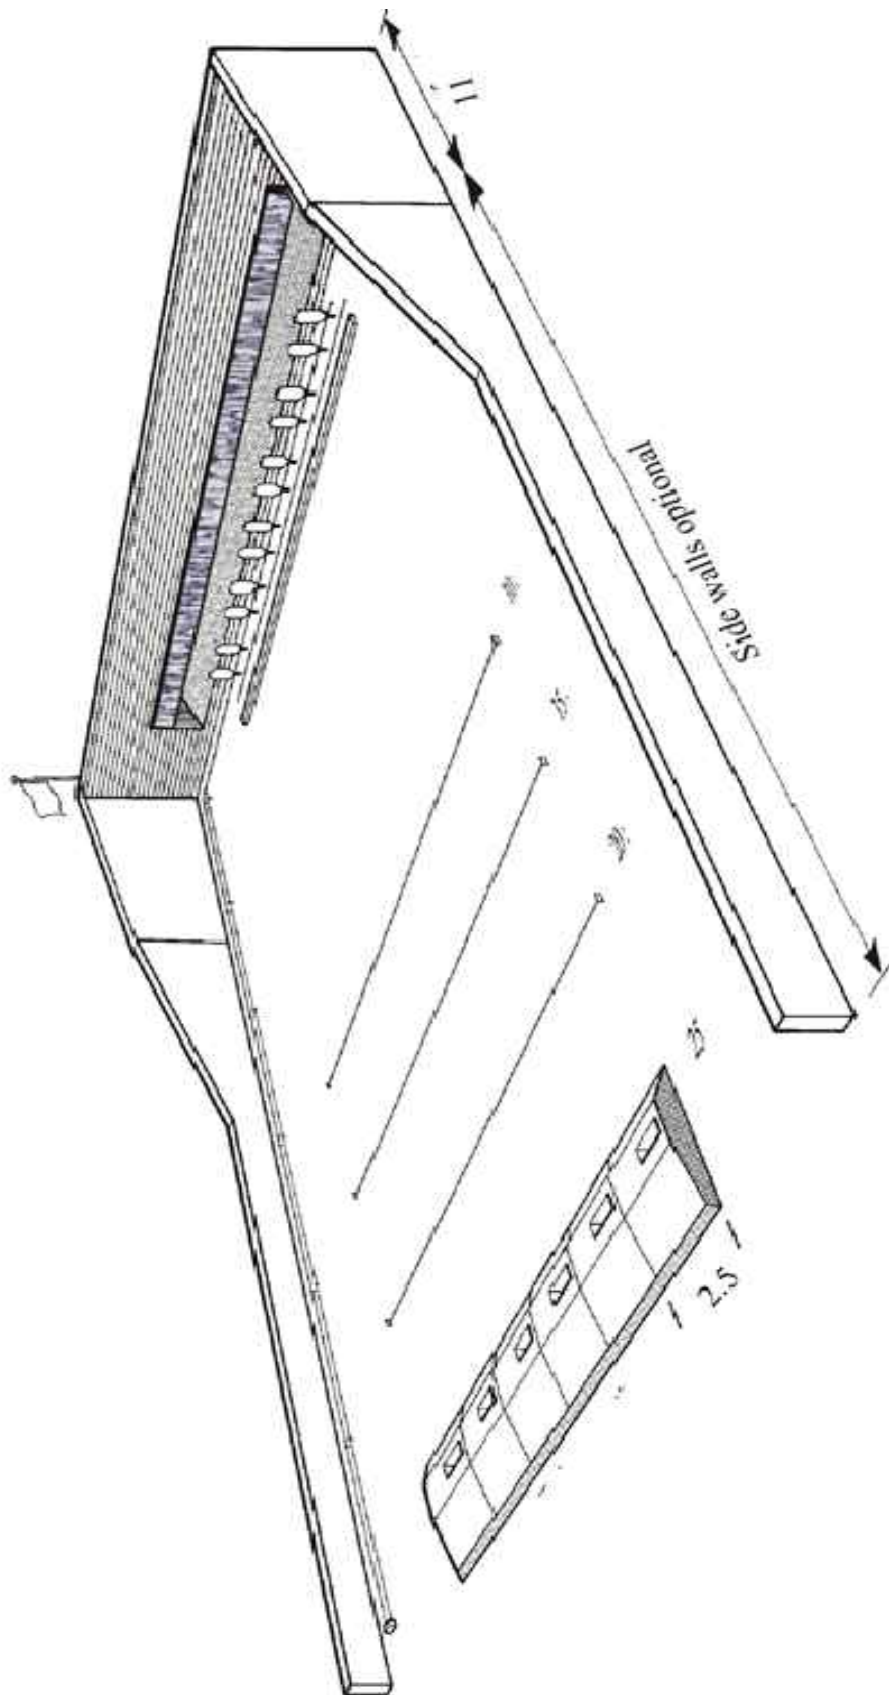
1. Typical Layout 25 Metre Barrack Range
